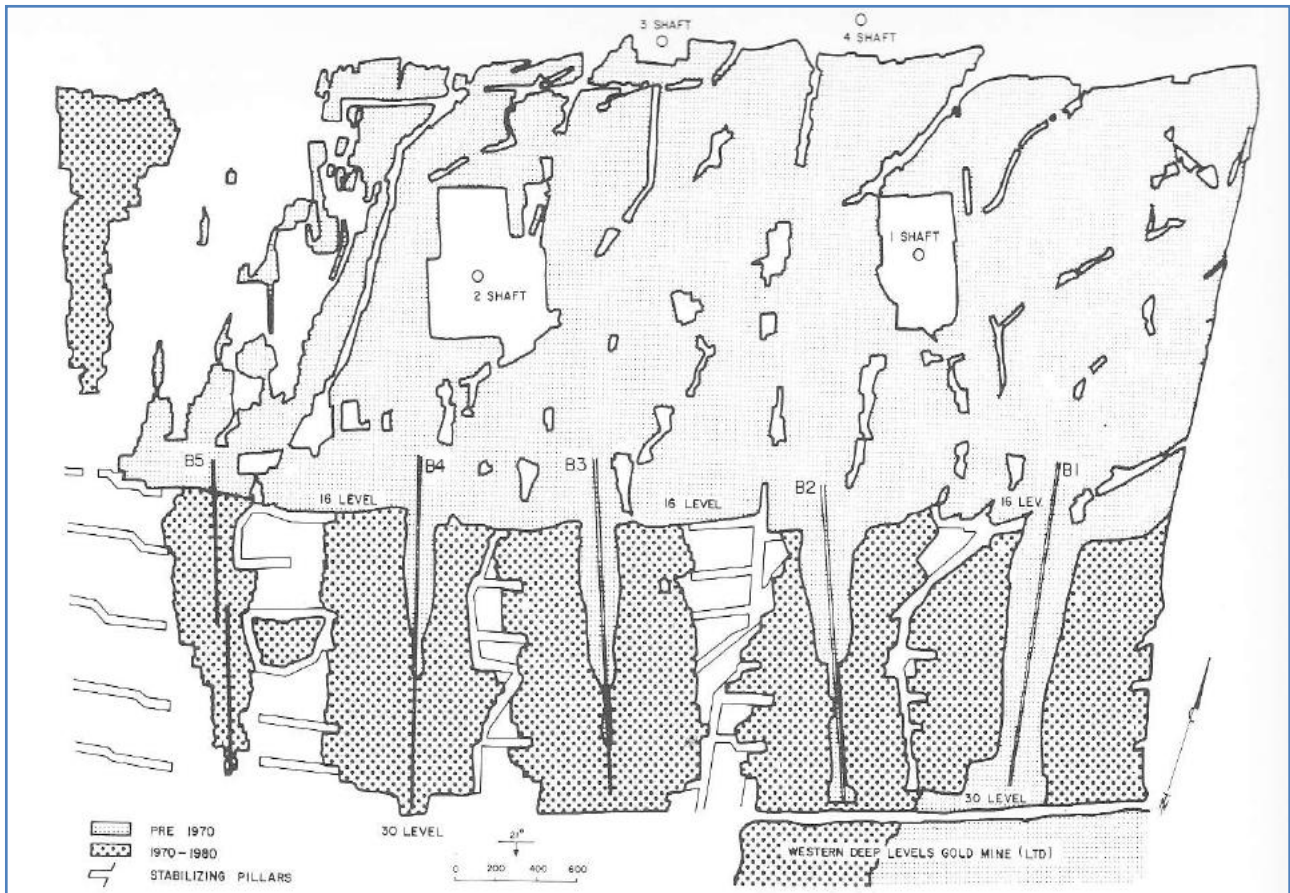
Plan of Blyvooruitzicht Mine, showing remnants above 16 level and the longwalls and stabilizing pillars below 16 level (after Spottiswoode, 1982)
